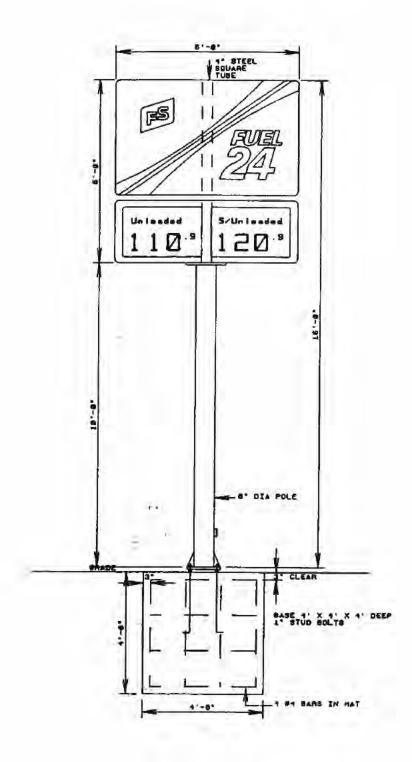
EXHIBIT C: SIGN DIMENSIONS #9808 · Kendall-Grundy F.S. · Sign · Special Use
